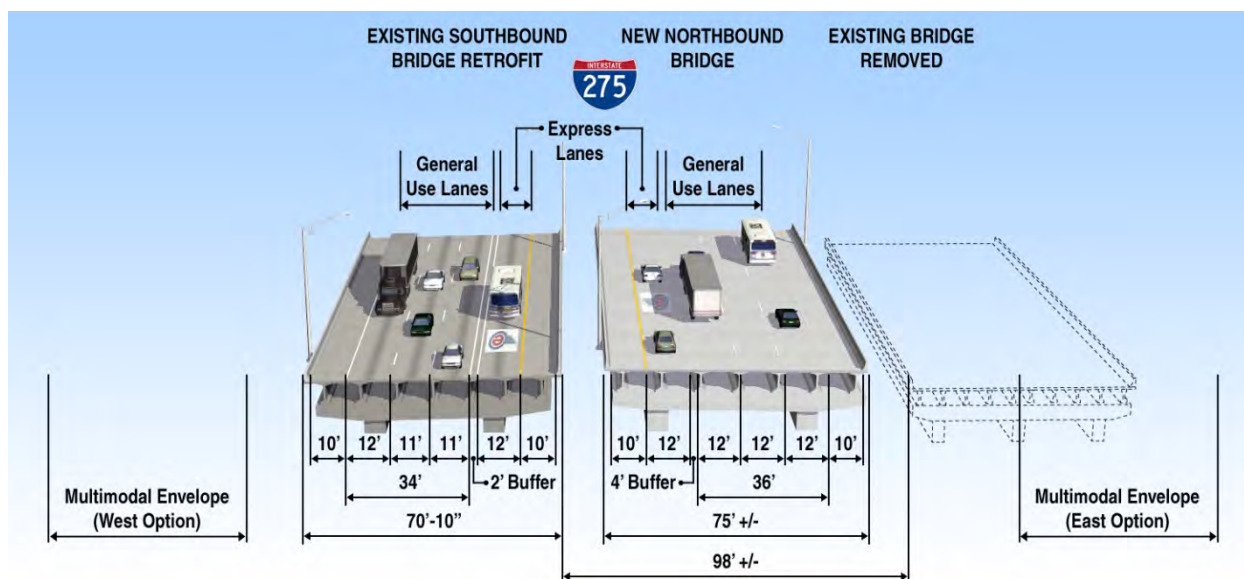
I-275 (HFB) EXPRESS LANES TYPICAL SECTION
